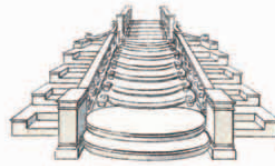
DETAILS FROM ITALIAN RENAISSANCE BUILDINGS
